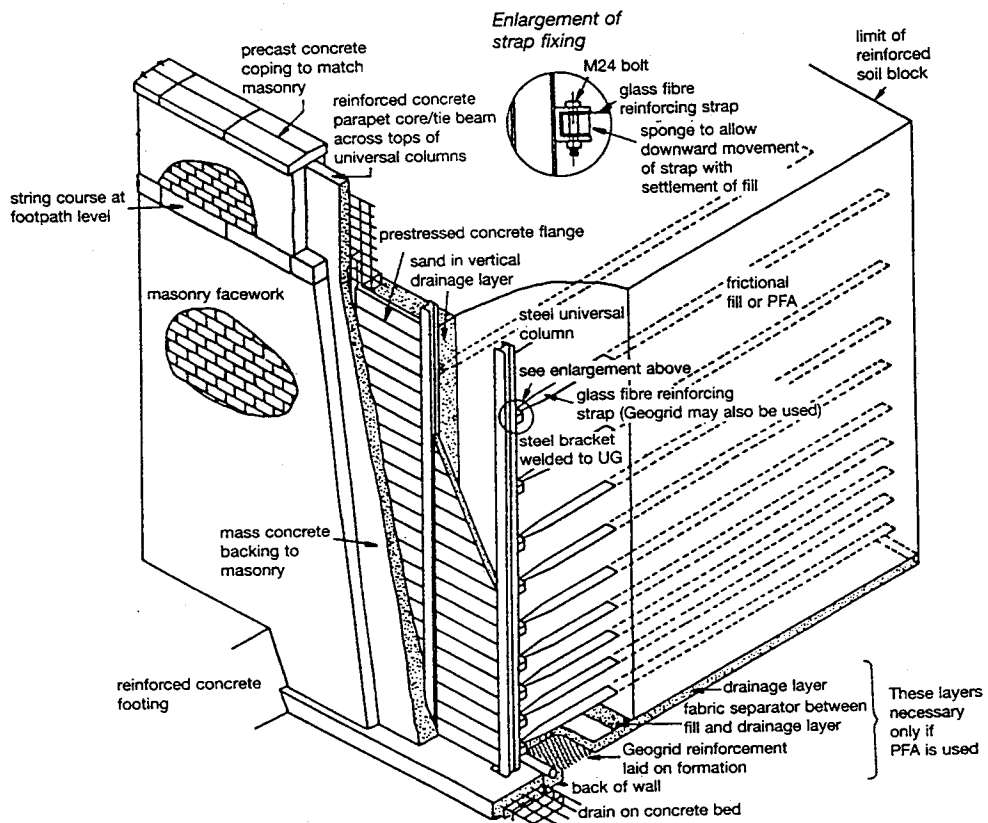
Reinforced Wall Detail to accommodate fill settlement
